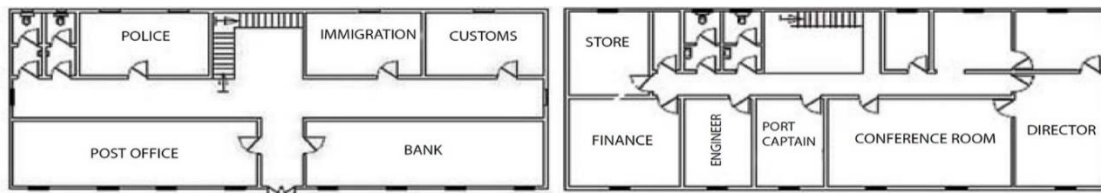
Typical layout of a large two-story administration building (ground floor at left).
